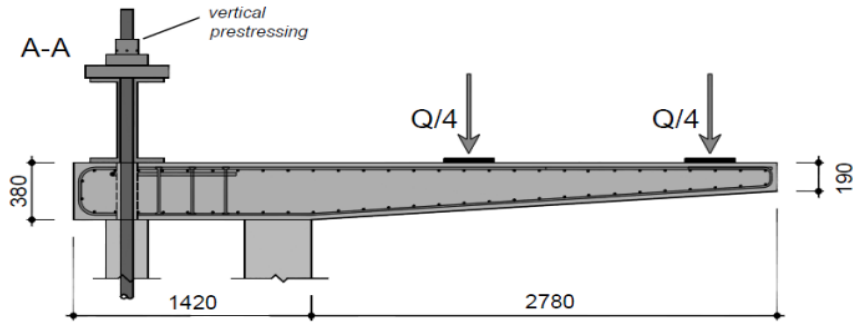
Slab dimensions, reinforcement layout, support arrangement and applied loads for the tests. From Vaz Rodrigues (2007).
